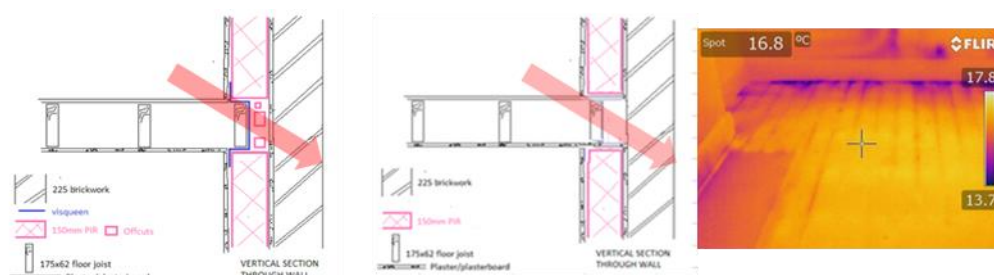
First floor/wall junction with IWI. There is likely to be a thermal bridge at floor level. The left hand example shows offcuts used between the joist and wall, although this is not always present, and if provided is unlikely to provide a continual effective insulating layer. The visqueen in the left hand example may avoid a breach of airtightness but may encourage condensation on the joist
